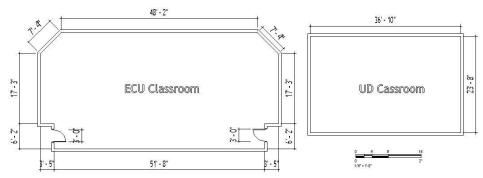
Classroom floor plans at ECU (left) and at UD (right)
